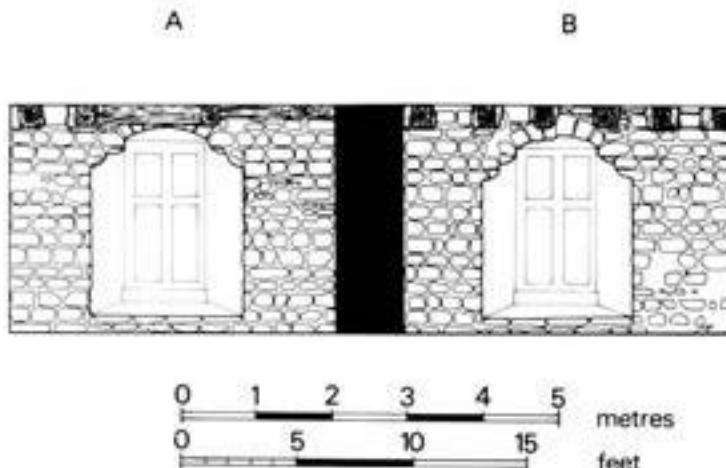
Elevation of the south wall on the second floor (room 16 A; room 17 B)
